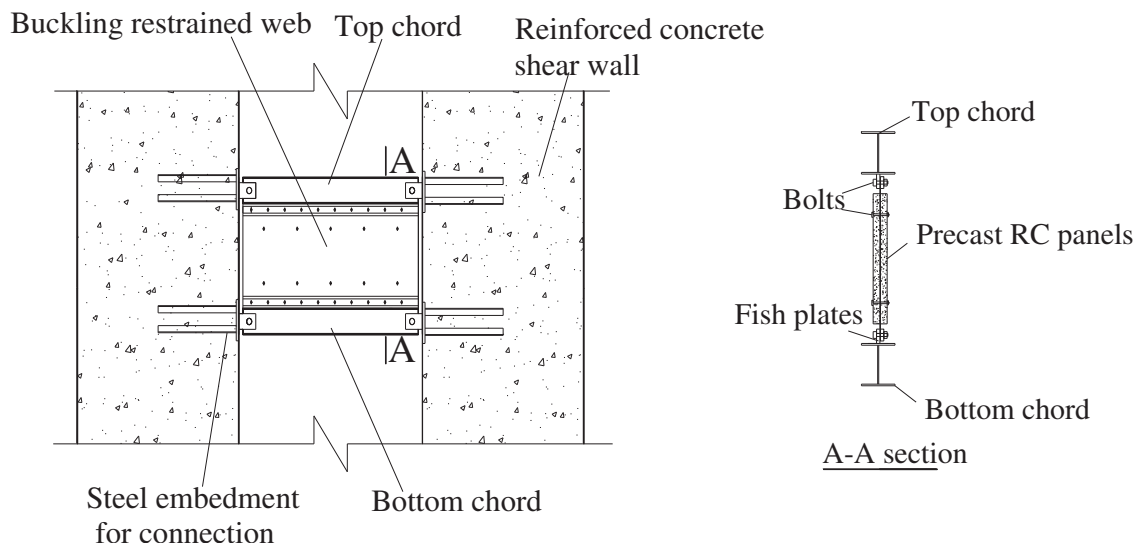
Proposed steel truss coupling beam with a buckling restrained web.
